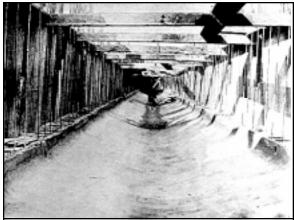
Interior of the Hagan Avenue Canal, shown during construction, ca. 1906. This concretelined and covered canal was constructed 1904-1906 (from Sewerage & Water Board 1906a).
